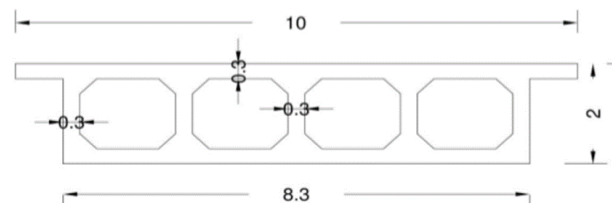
Cross-sectional details of 4 celled Concrete Box Girder (all dimensions in meter)
